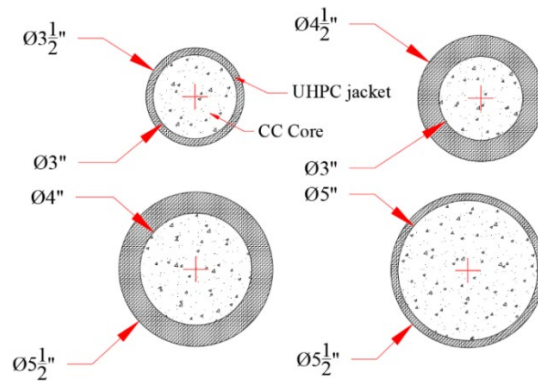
Phase 1 small specimens without reinforcement (Ronanki et al., 2022)
